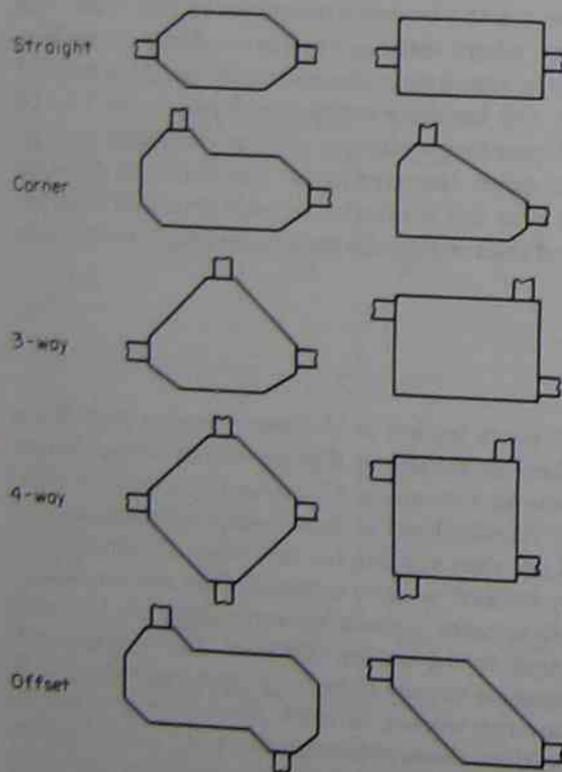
Typical shapes of cable manholes. (From EEI *Underground Systems Reference Book*.)
